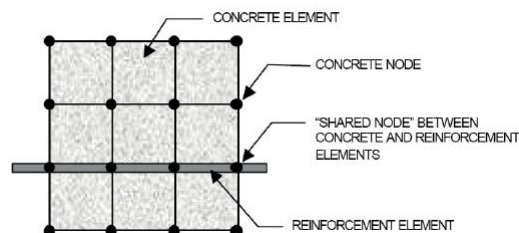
Shared nodes between concrete and reinforcement (Sangi, A.J 2011)
